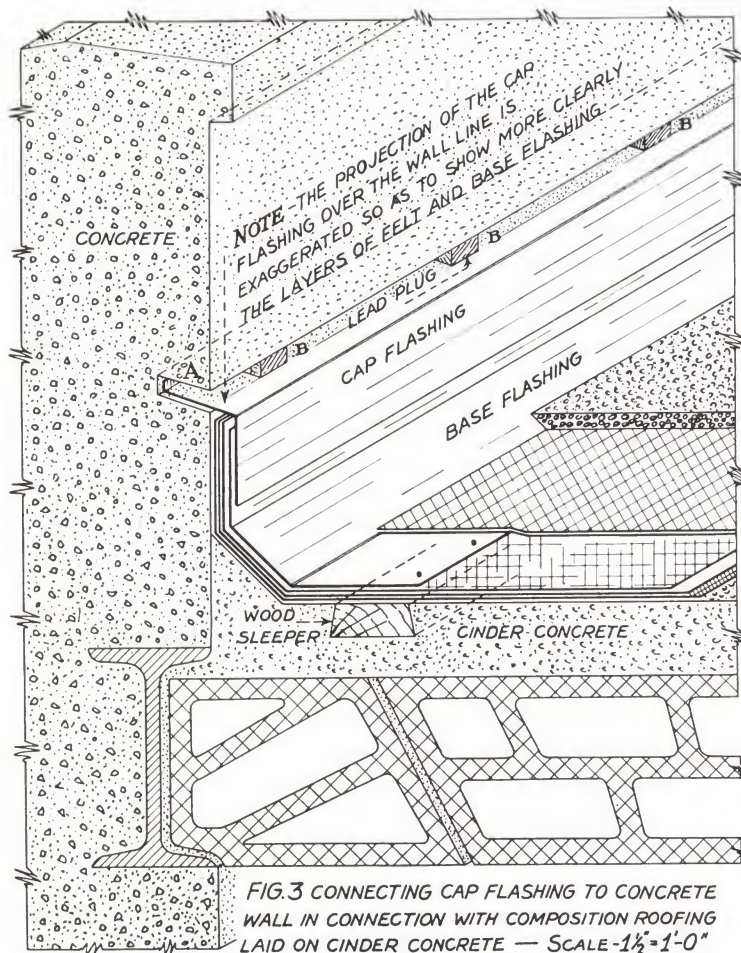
CONNECTING CAP FLASHING TO CONCRETE
